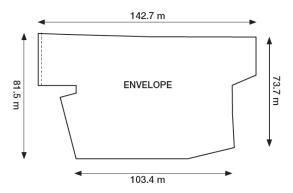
Block B site boundary Source: Woods Bagot & SOM architects
